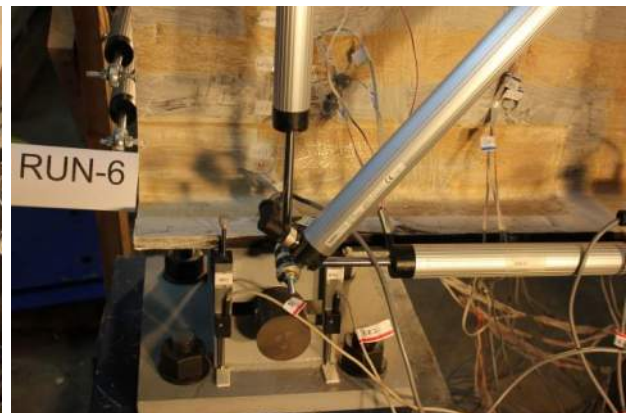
Damaged Girder Bearing: Failure
